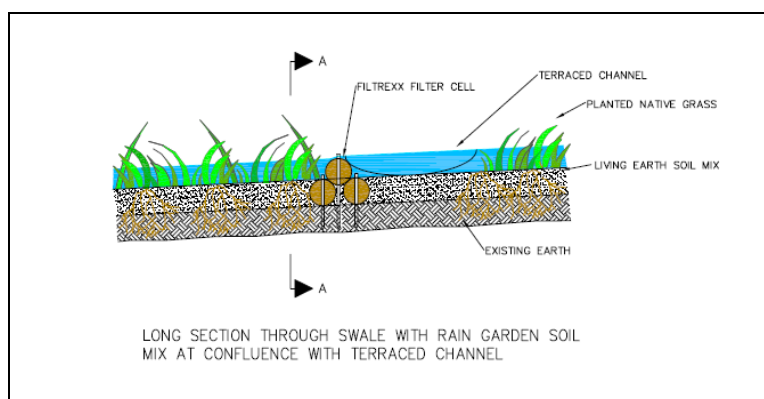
Rook Swale concept design showing long section through swale at the point intersection of the swale and terraced channel
